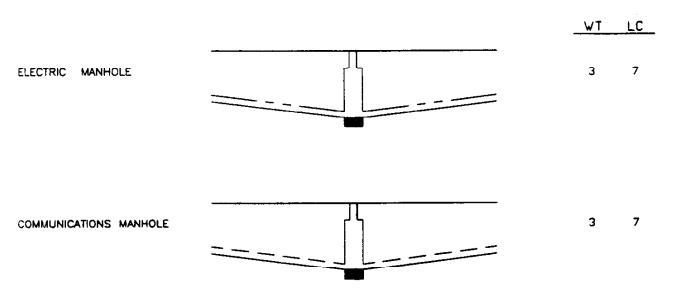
(CONTINUED) PROPOSED IMPROVEMENTS PRIVATE UTILITIES PLAN VIEW
